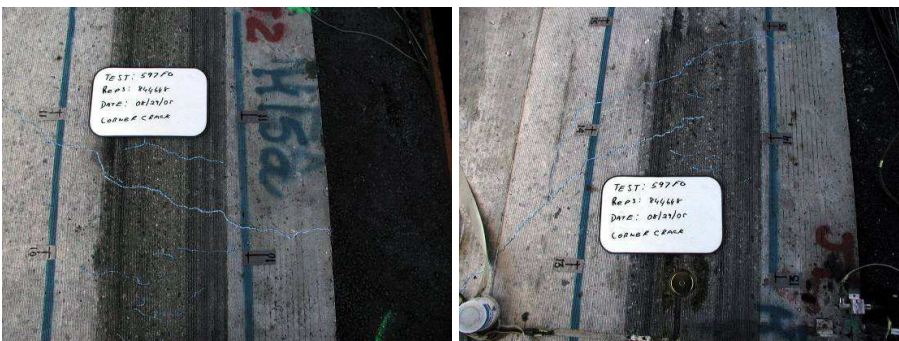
Fully developed corner cracks at one of transverse joints of Section 1, when loaded in dry pavement conditions
